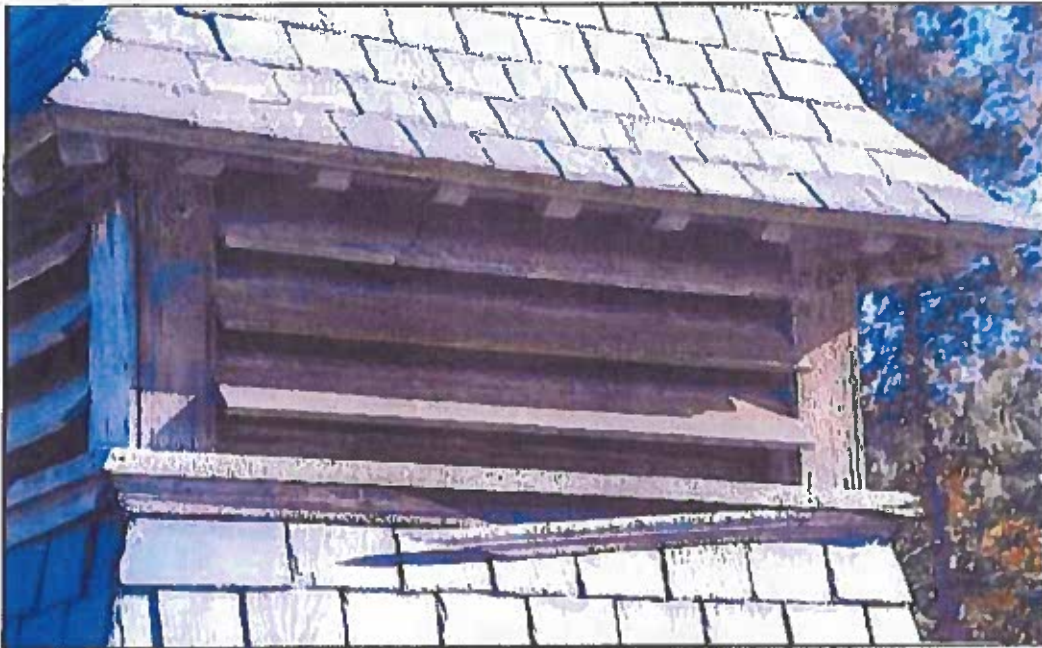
West face of cupola showing broken bed mold under sill. Bed mold on north face (left) is a mismatched replacement. Corner boards are weathered with small splits. Rounded modillion blocks under eaves appear to remain sound. Replace bedmolds and split cornerboards.
